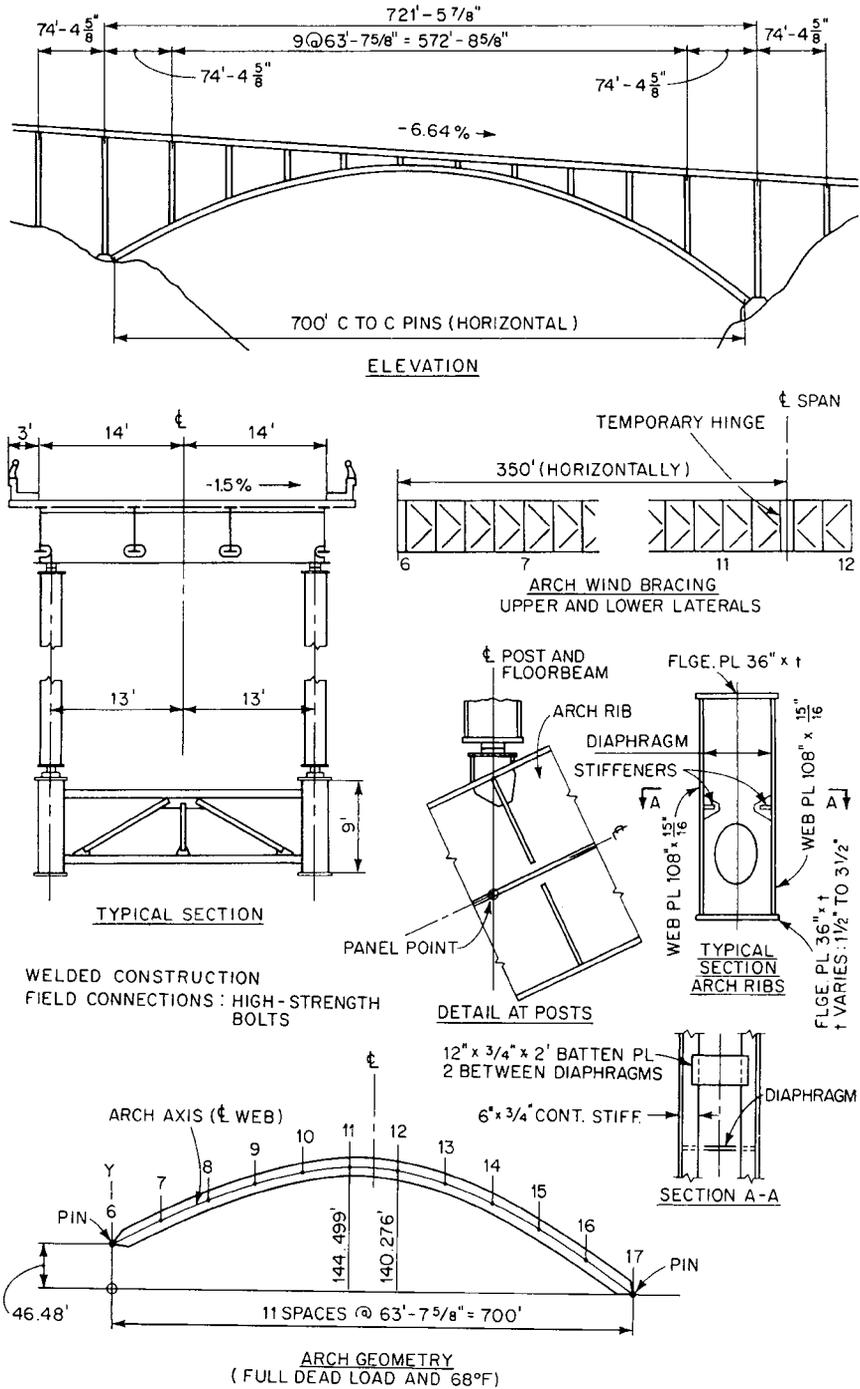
Details of Cold Spring Canyon Bridge.
